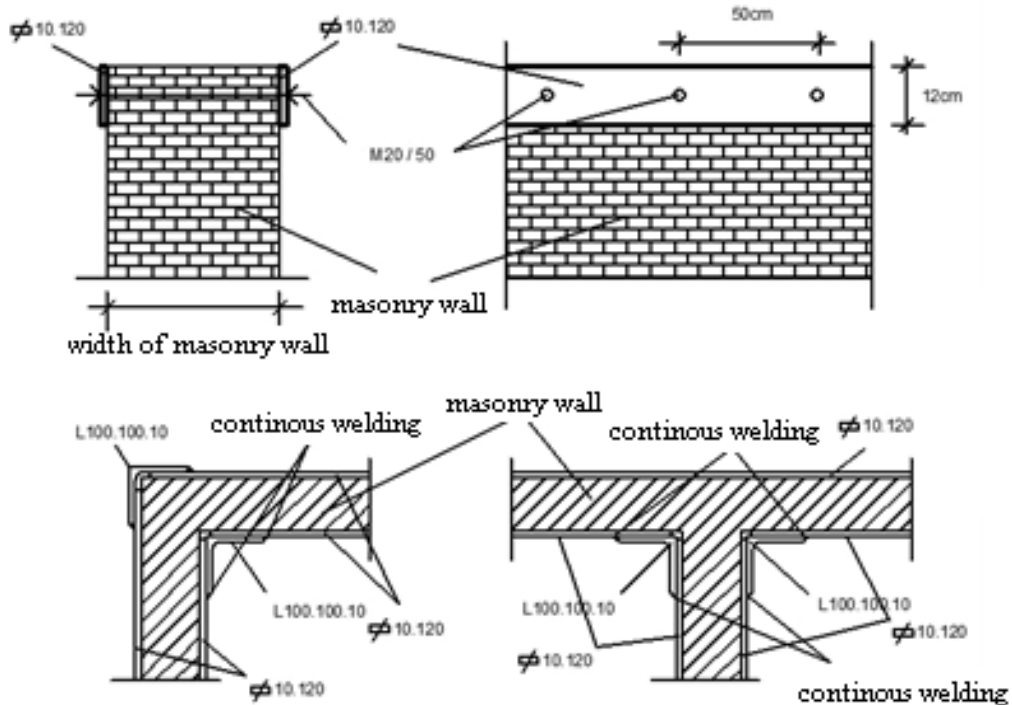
Repair of the wide crack in the wall (Sesigür et al., 2007).
